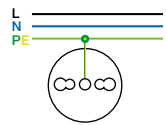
Socket outlet with earthing contact DENMARK – 2-pin + earth, 250 V~, 13 A
